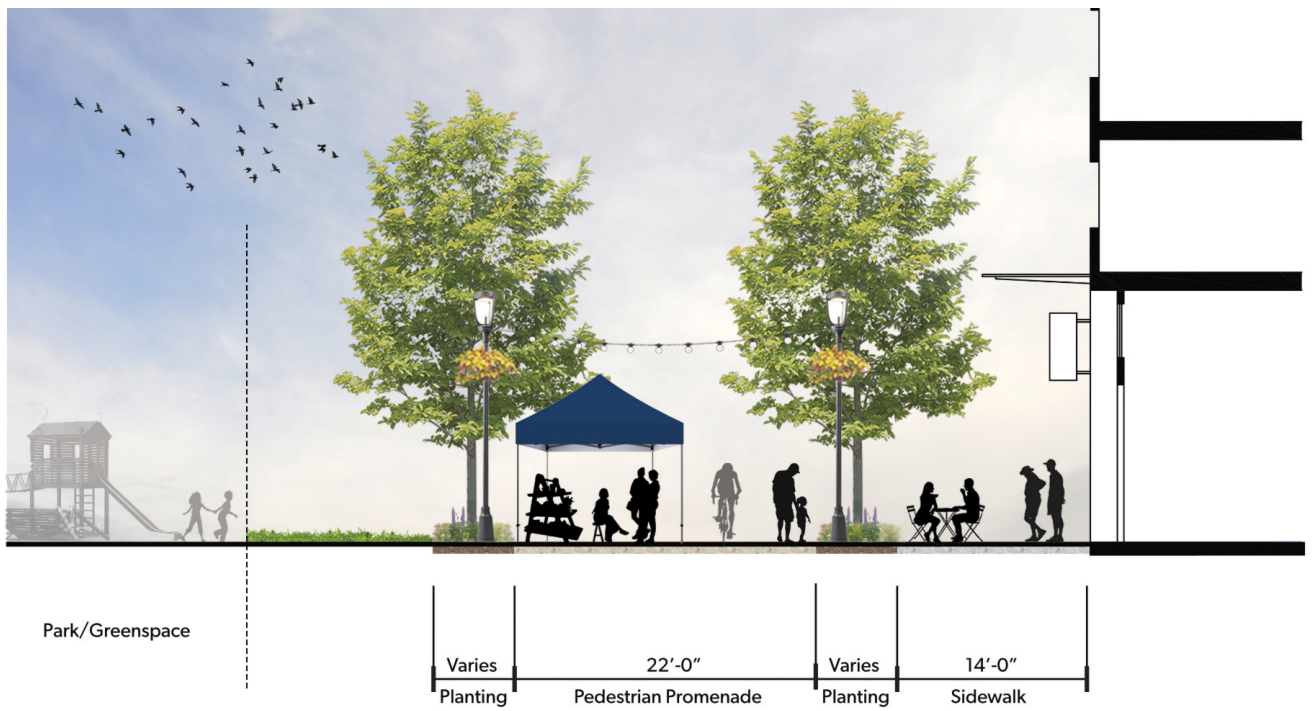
E-E | Pedestrian Retail Path at Central Park North
